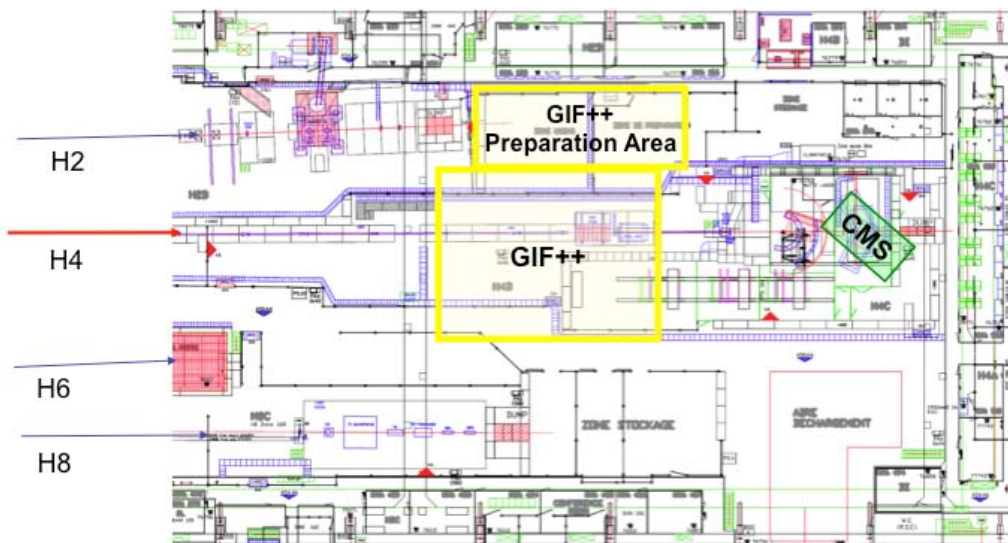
Floor plan of part of the H4 beam line in the EHN1 (CERN Building 887). GIF++ is located at the end of the beam line, downstream is the CMS ECAL beam test area [5].
